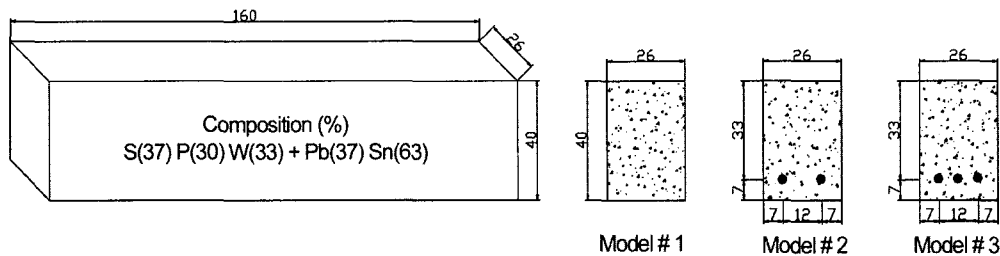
Section of the beam for 3 types of test models (unit: mm)
